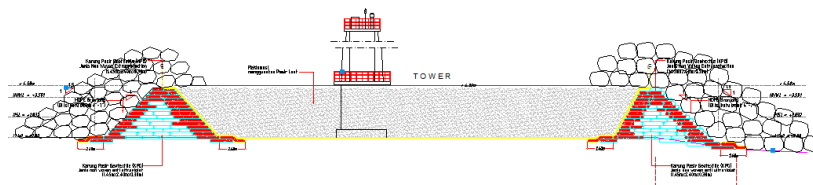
Cross-section of the compilation of planning protection structure with crushed stone armor.
